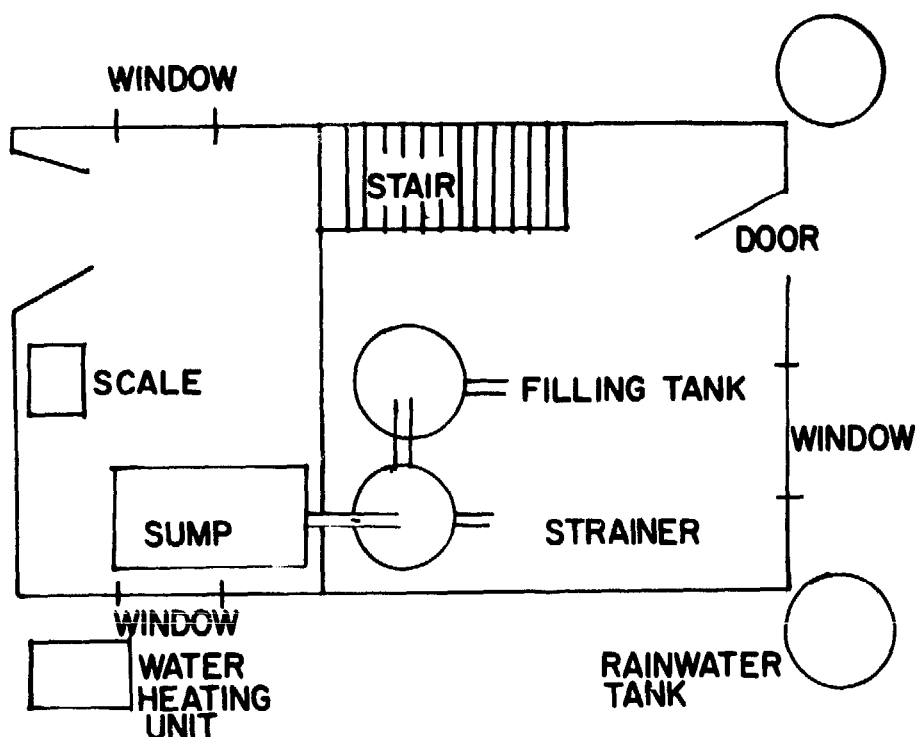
/4 Plan of a simple honey-collecting centre on a hillside. Two rain-water tanks (right) are at the lower end of the building, while the unloading door and scales are at the higher end.
